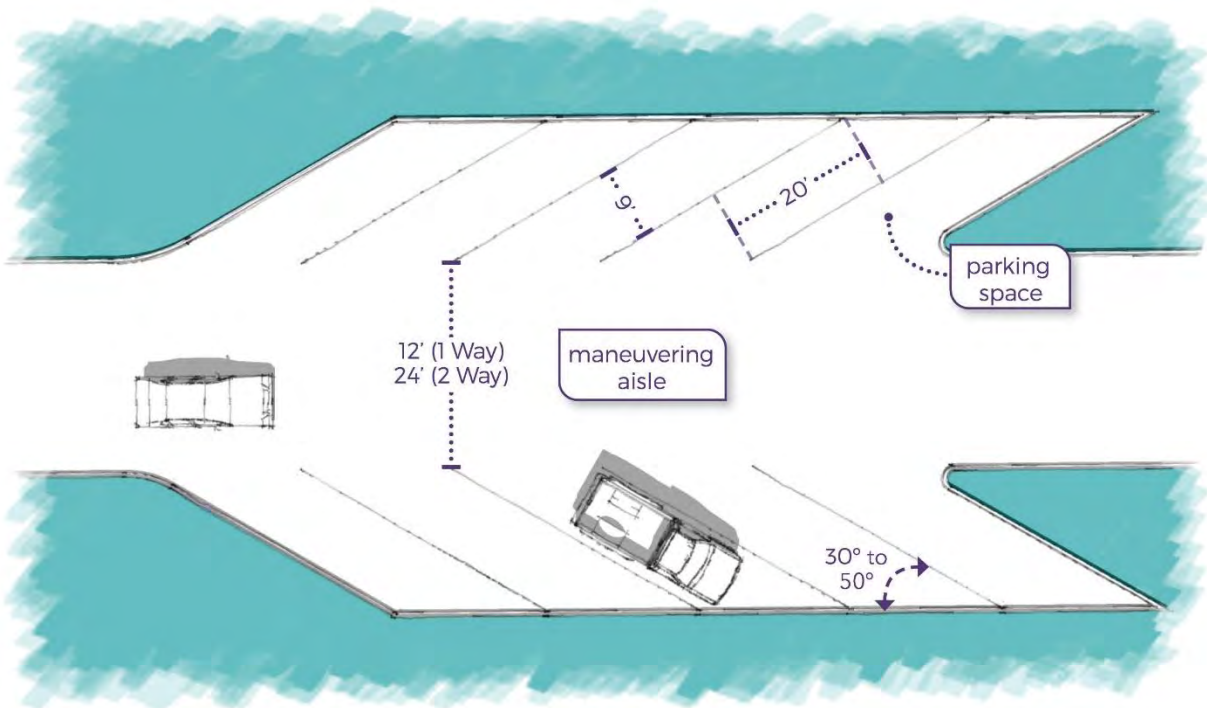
B. PARKING SPACE DIMENSIONS: 30-53 DEGREES
